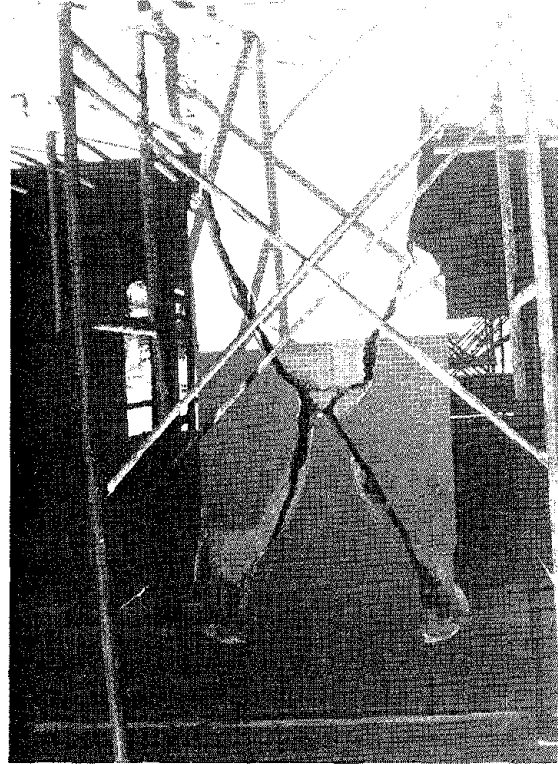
Heavily damaged stiff column at corner of apartment building shown in Figure 5.51.
